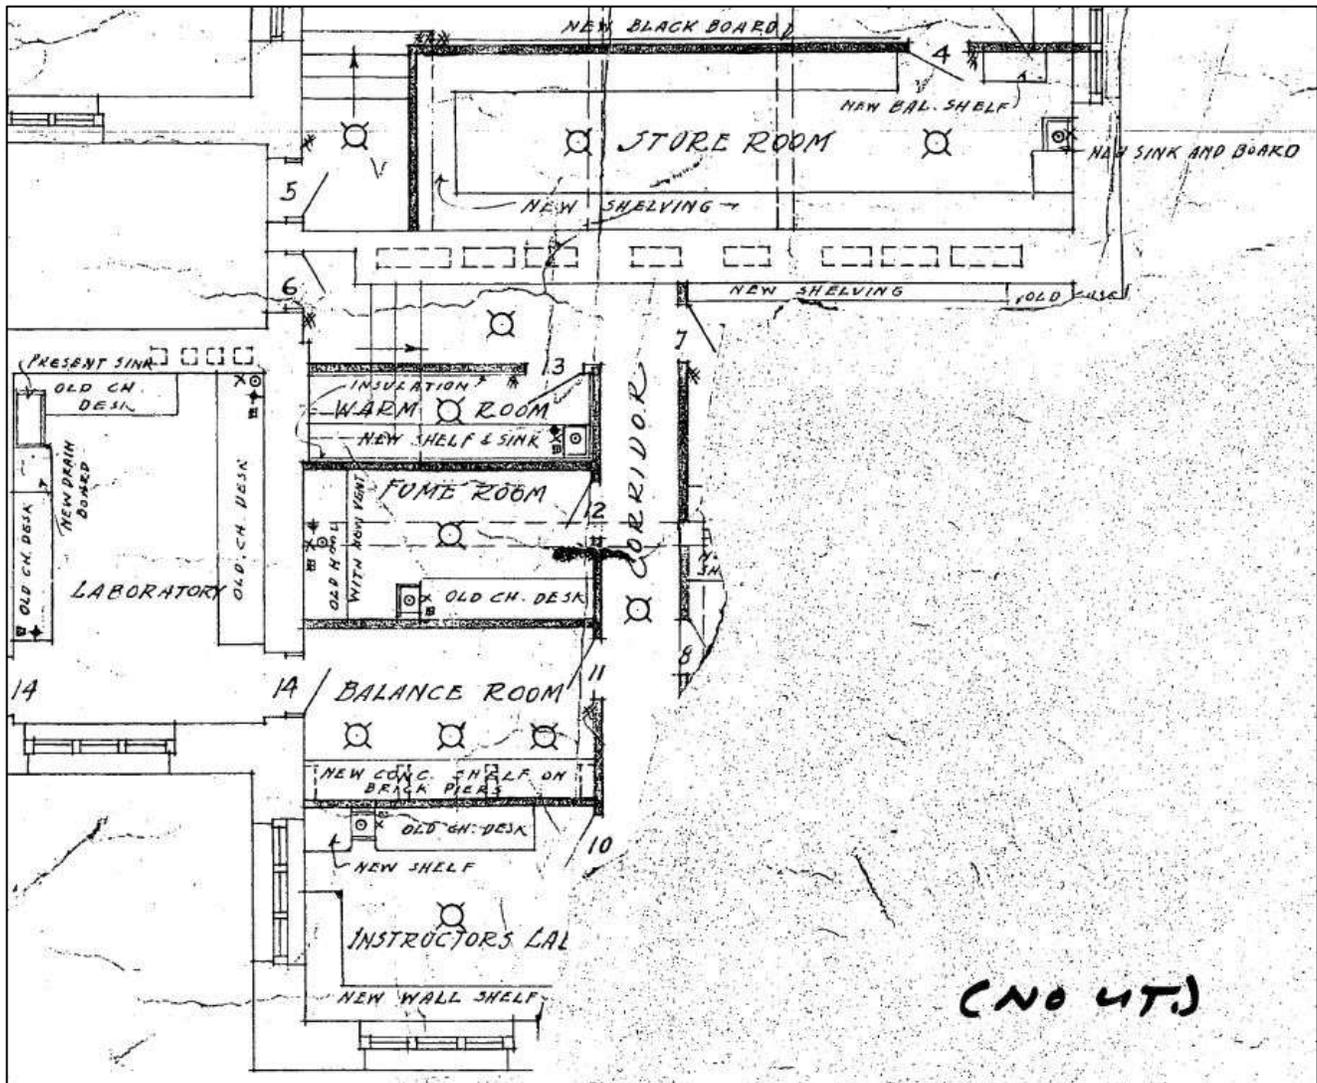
1917 Science Hall renovation plans, basement, showing the missing portion of the plan for the northeast corner. Source: University of Wisconsin-Madison Facilities Planning & Management.
